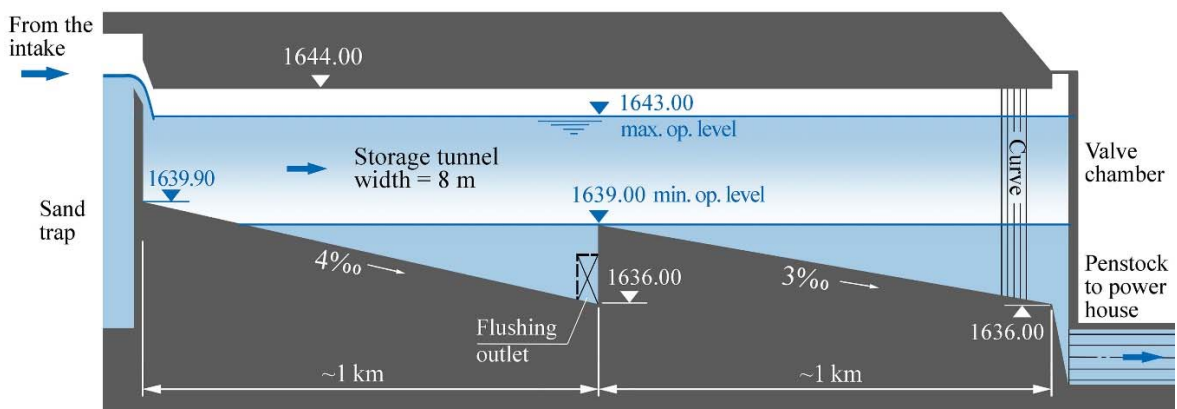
Schematic longitudinal profile of the storage tunnel of HPP Fieschertal (based on construction drawings, GWK 1972).
